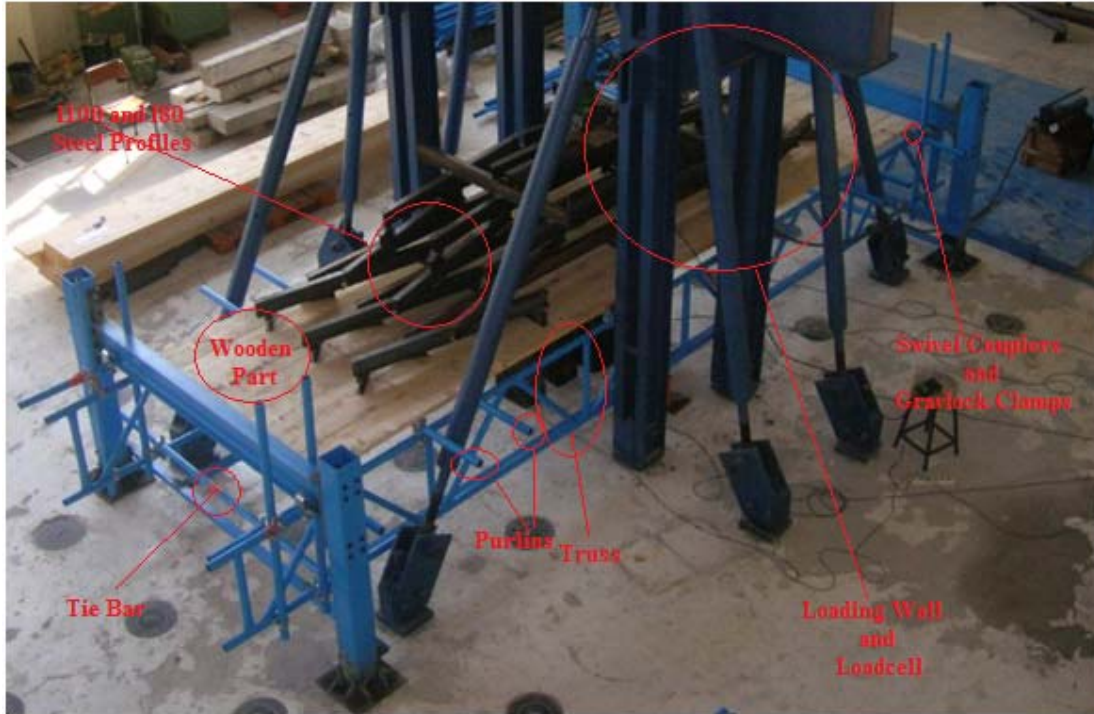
Full-scale 3D Steel Pipe-rack Suspended Scaffolding System
